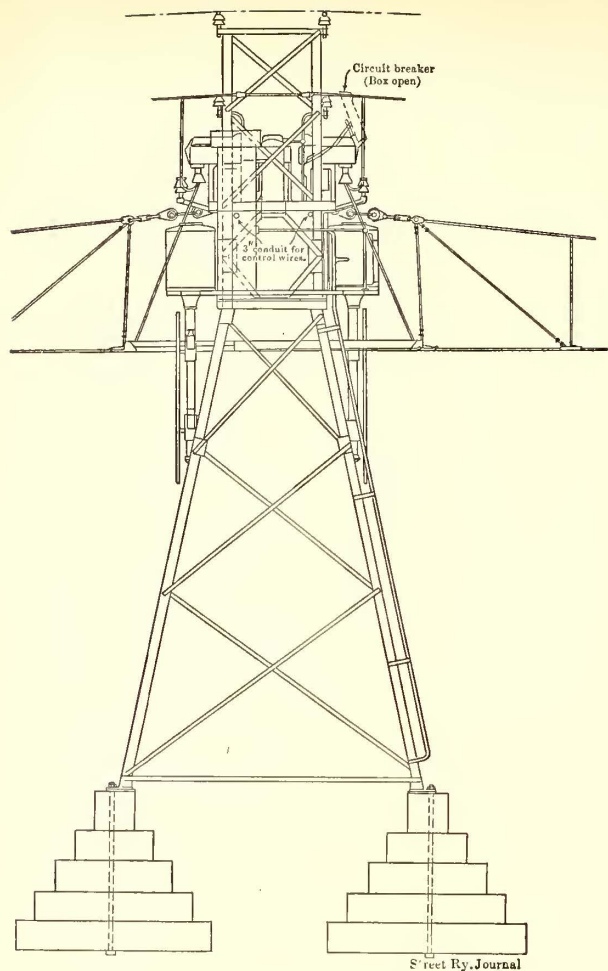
END VIEW OF ANCHOR BRIDGE
